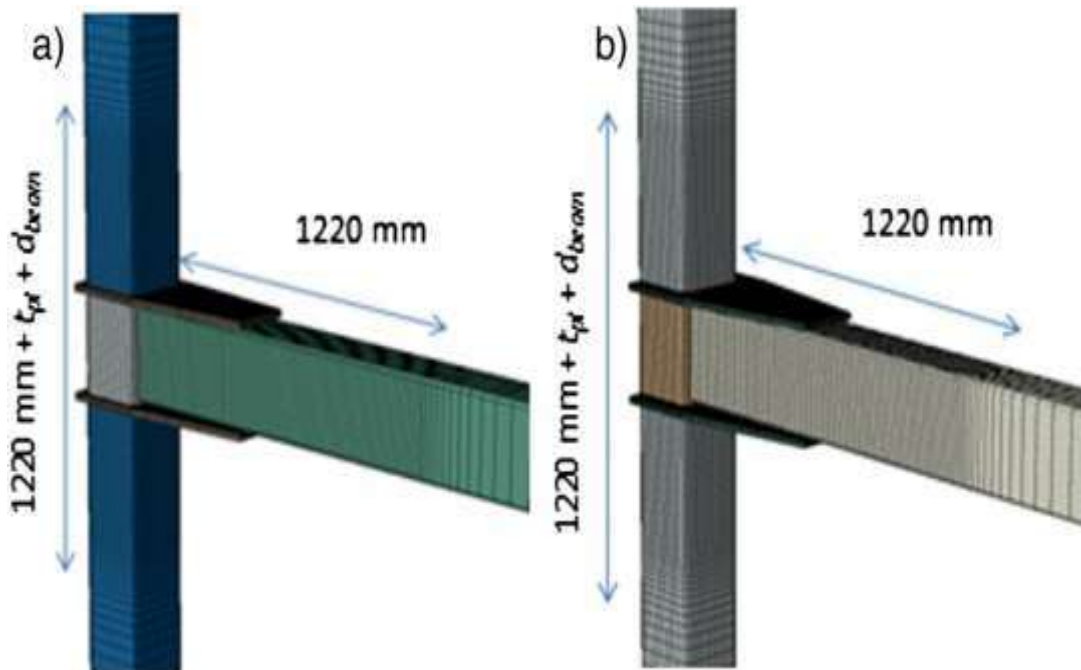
Finite element models for the (a) through plate and (b) external diaphragm plate HSS-to-HSS moment connections.
